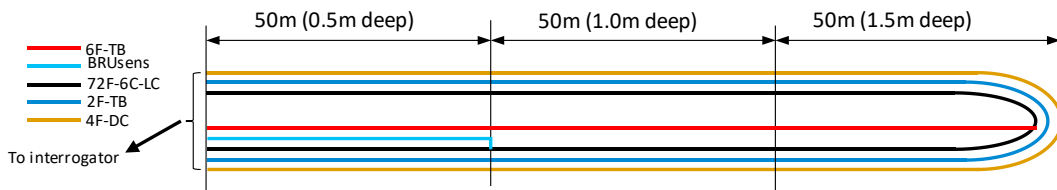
Diagrammatic plan on cable trench showing cable arrangement.
